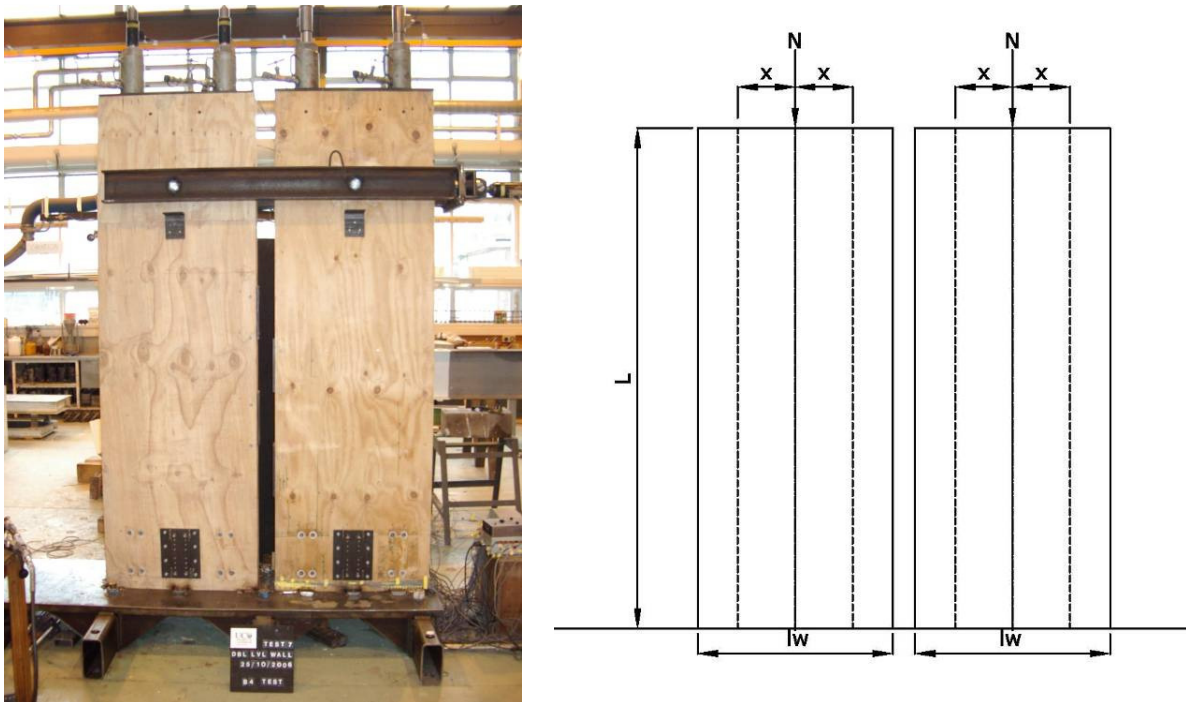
View of PT-only walls a) test specimen b) with dimensions
